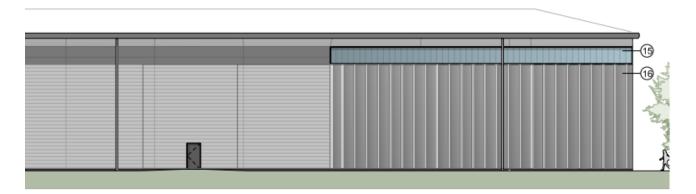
South West Elevation of Unit 1 to 3 as amended
